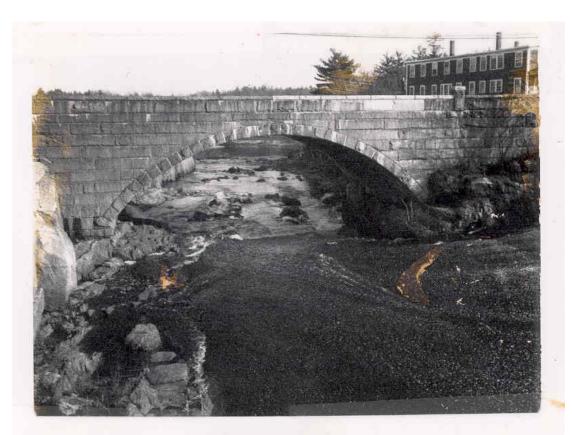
, Date: 1975, Courtesy NHDES, Dam Safety Description: Looking downstream at Chamberlain Bridge
